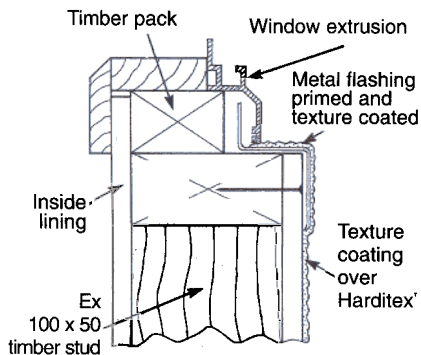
JAMB DETAIL (ALTERNATIVE 1)
